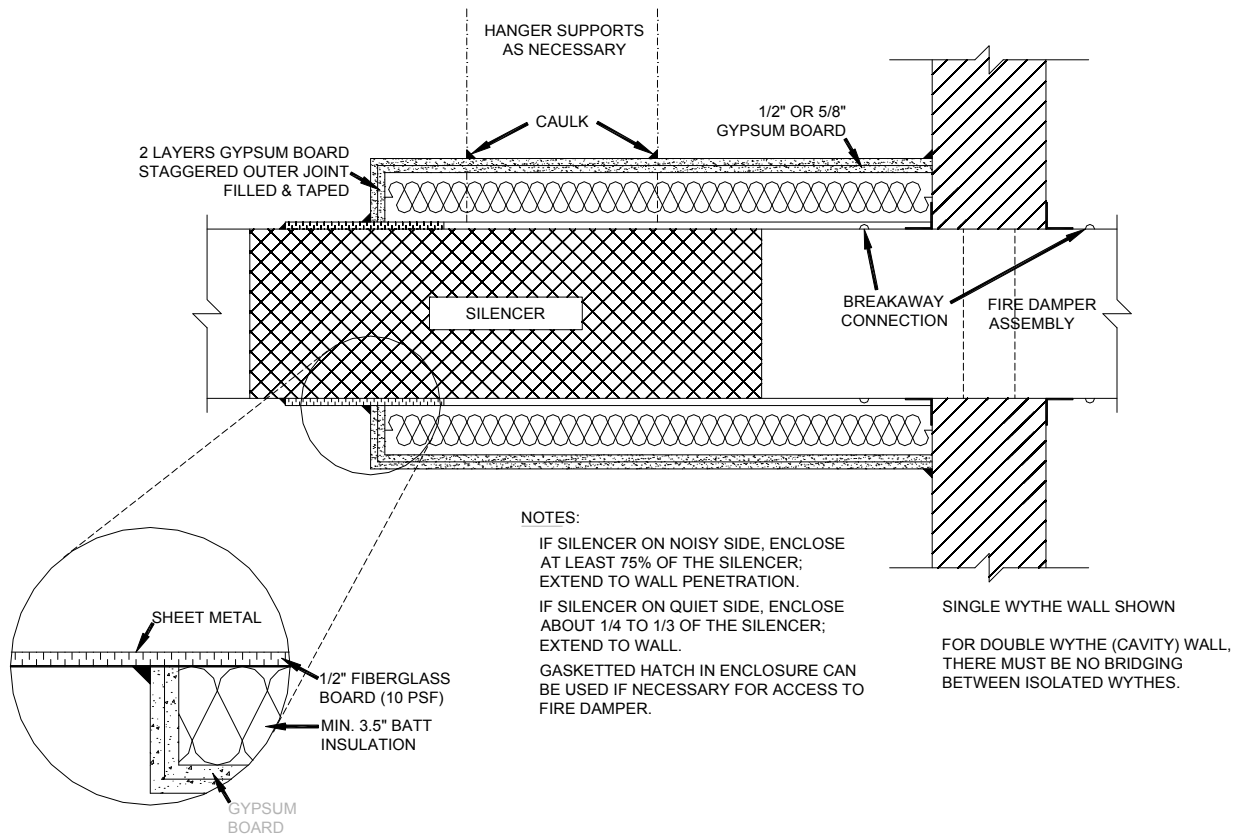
Typical Enclosure for Silencer Using Gypsum Wall Board
